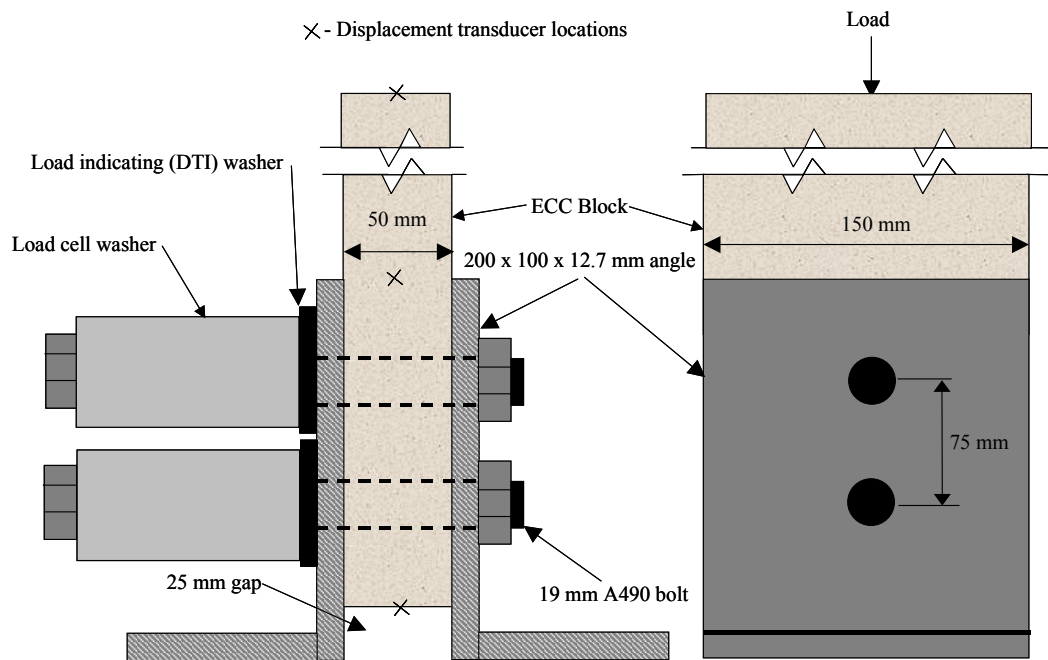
Connection test setup with load oriented parallel to axis of bolts
